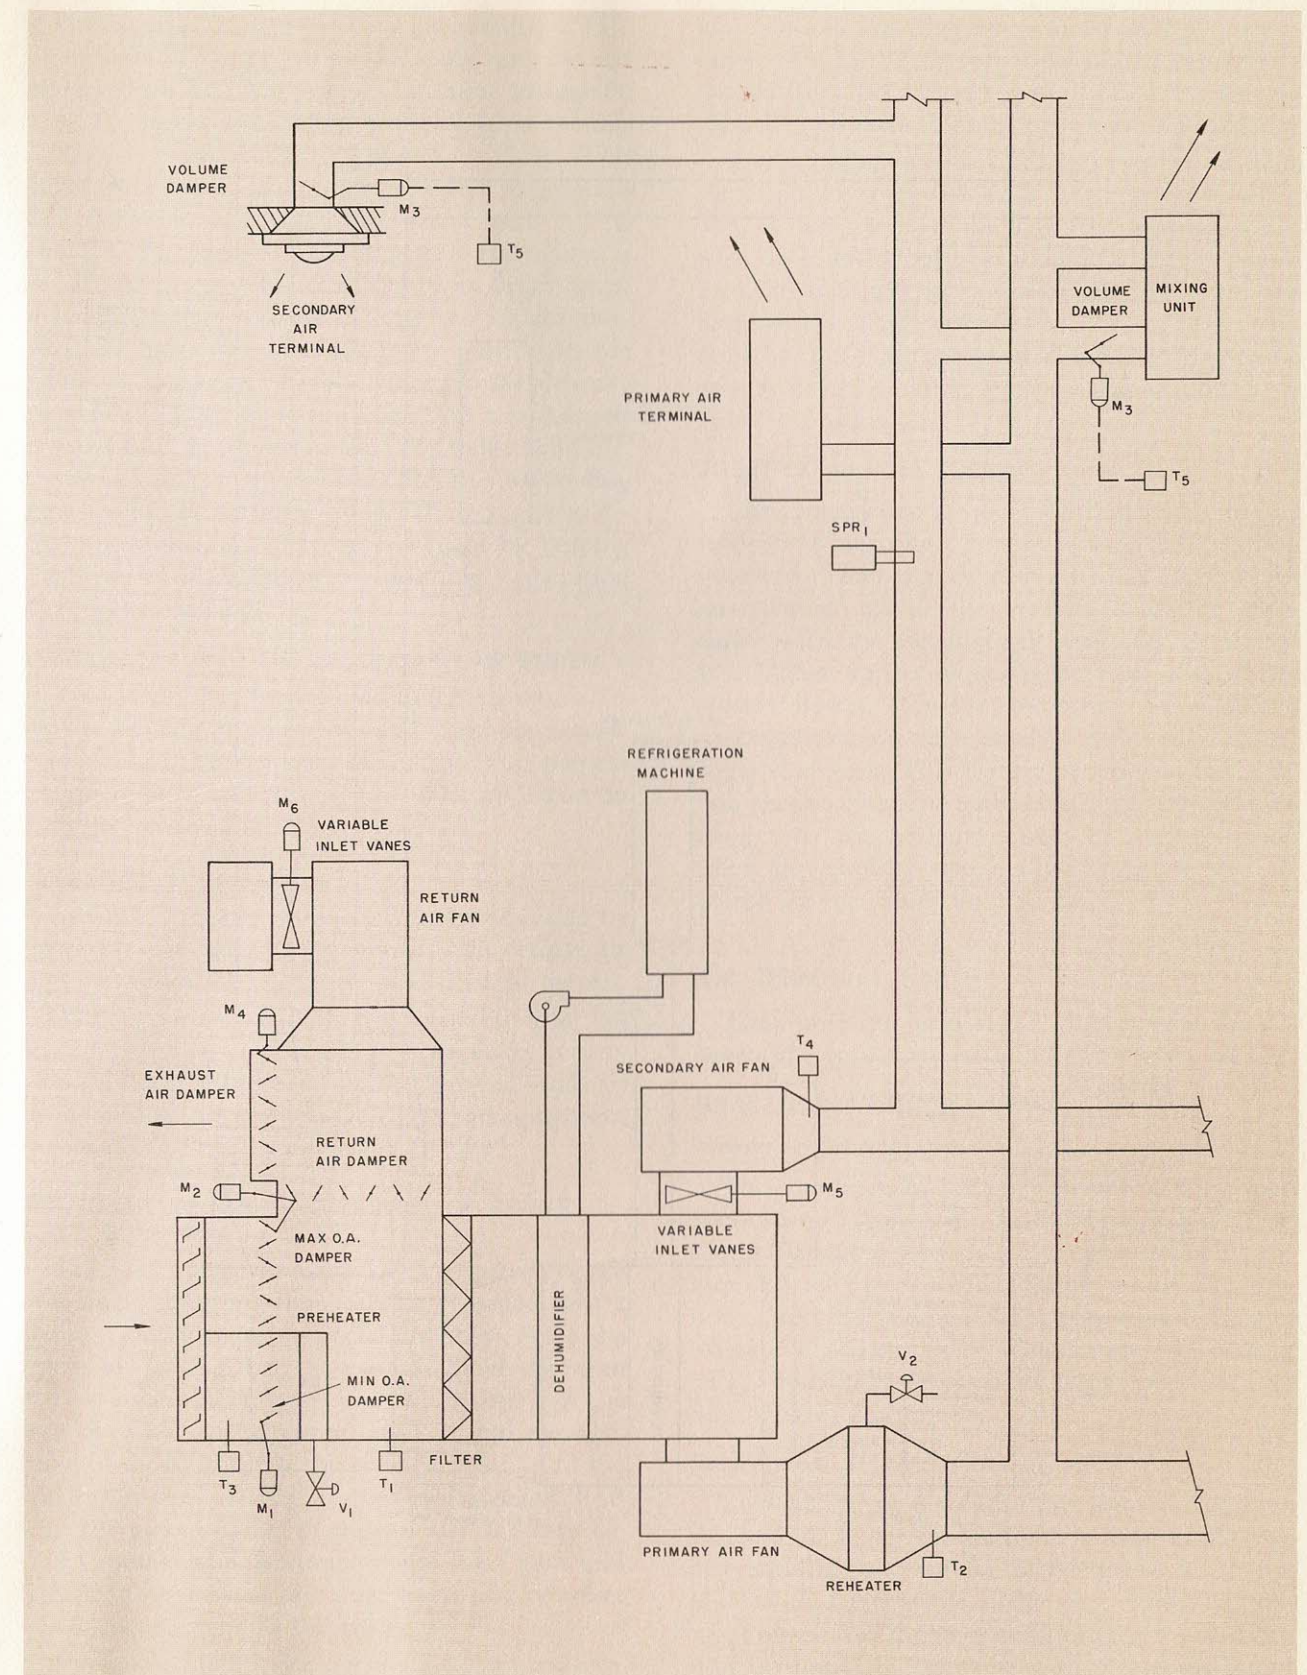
TYPICAL DUAL CONDUIT SYSTEM, DUAL-FAN, SINGLE APPARATUS
